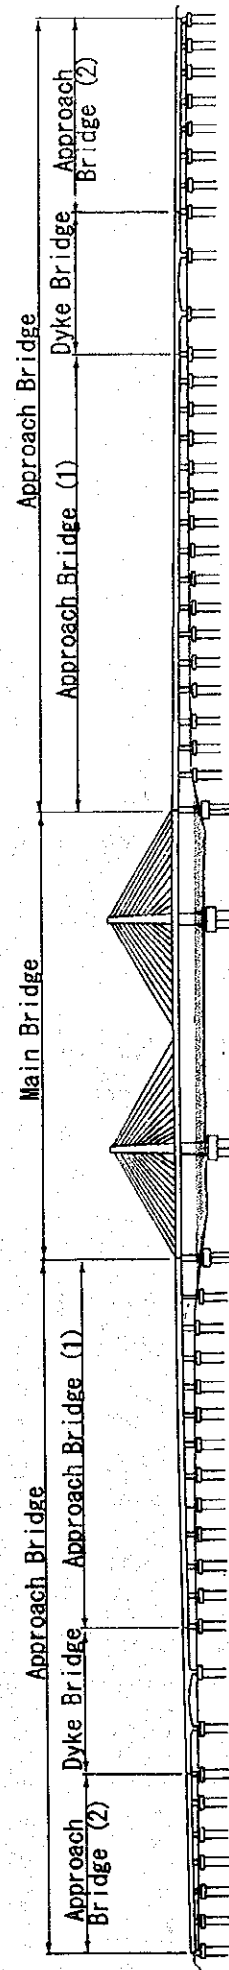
Concept of Alternatives of Thanh Tri Bridge
